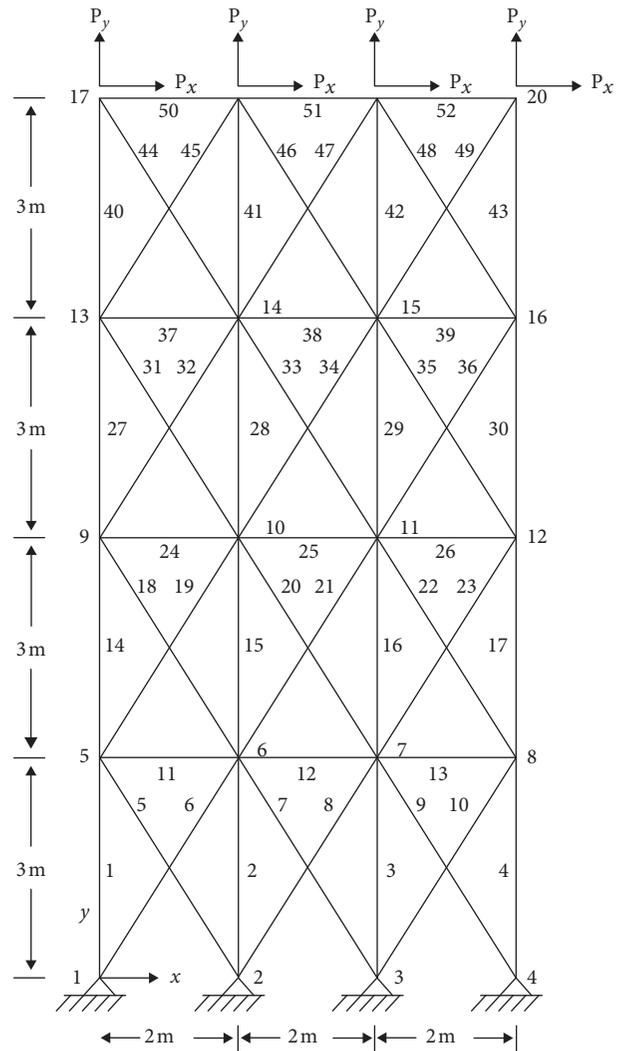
Schematic diagram of the 52 bar plane truss structure.
